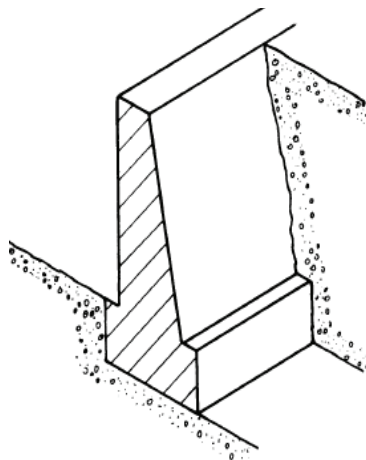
Mass Concrete wall with battered back (BS 8002)
